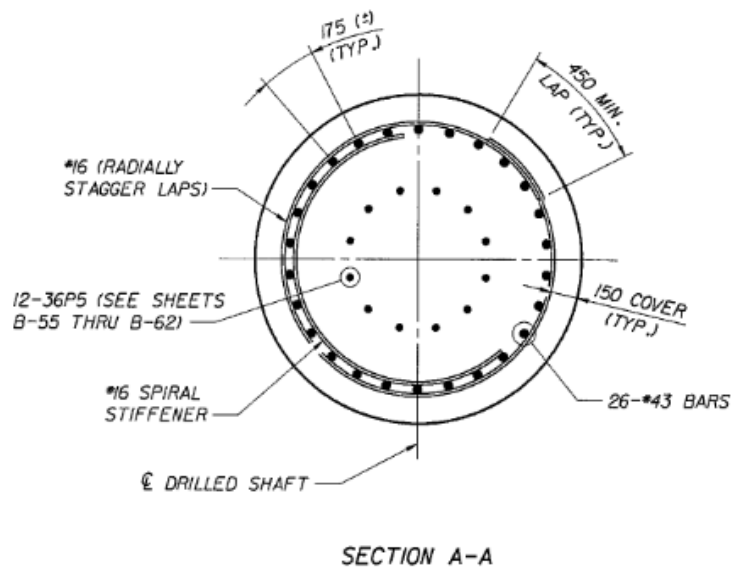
Drilled shaft reinforcement cage configuration, 6-ft (1.83m) diameter.
